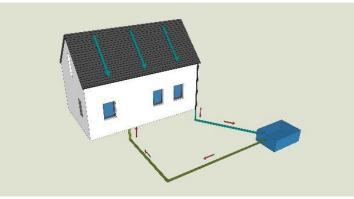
Sketch of tank located underground for storage of rainwater which can be re-used.
